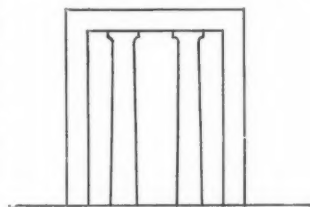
THE FAÇADE OF AN EARLY TEMPLE.
